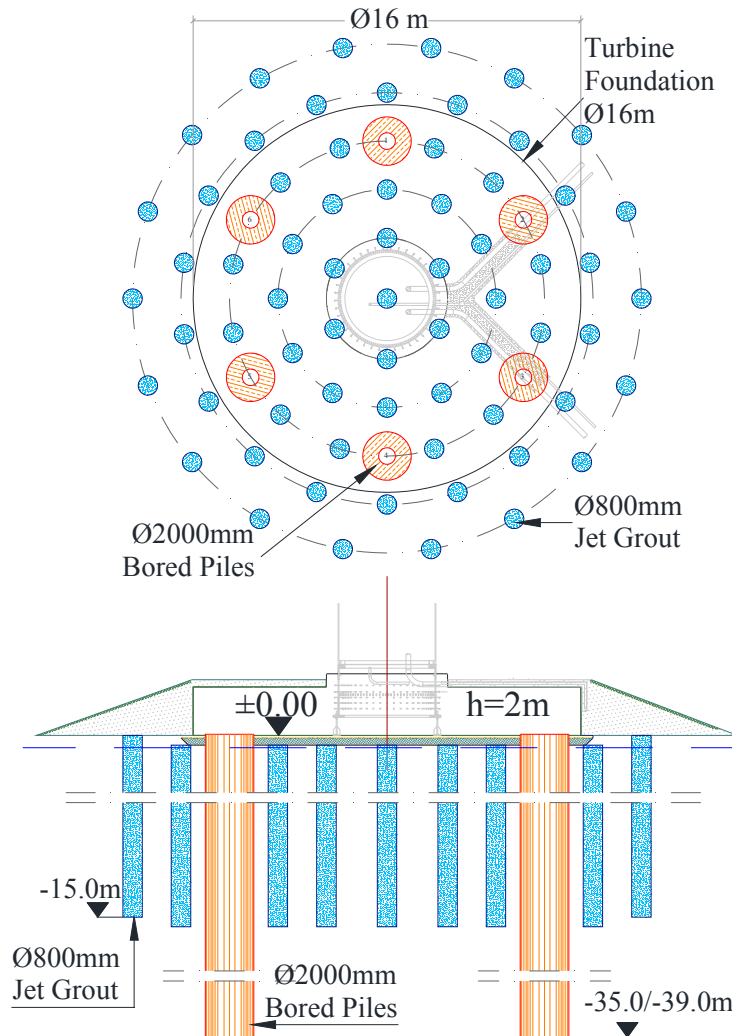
Proposed Design, Deep Foundation and Soil Improvement Applications
